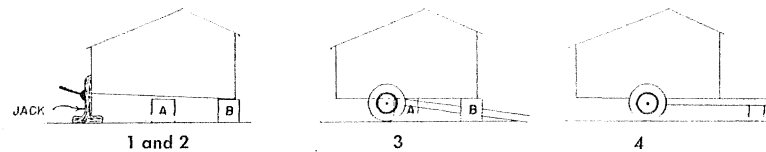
A set of detached skids and a wheeled mover. They may be used to move any portable farm building.
